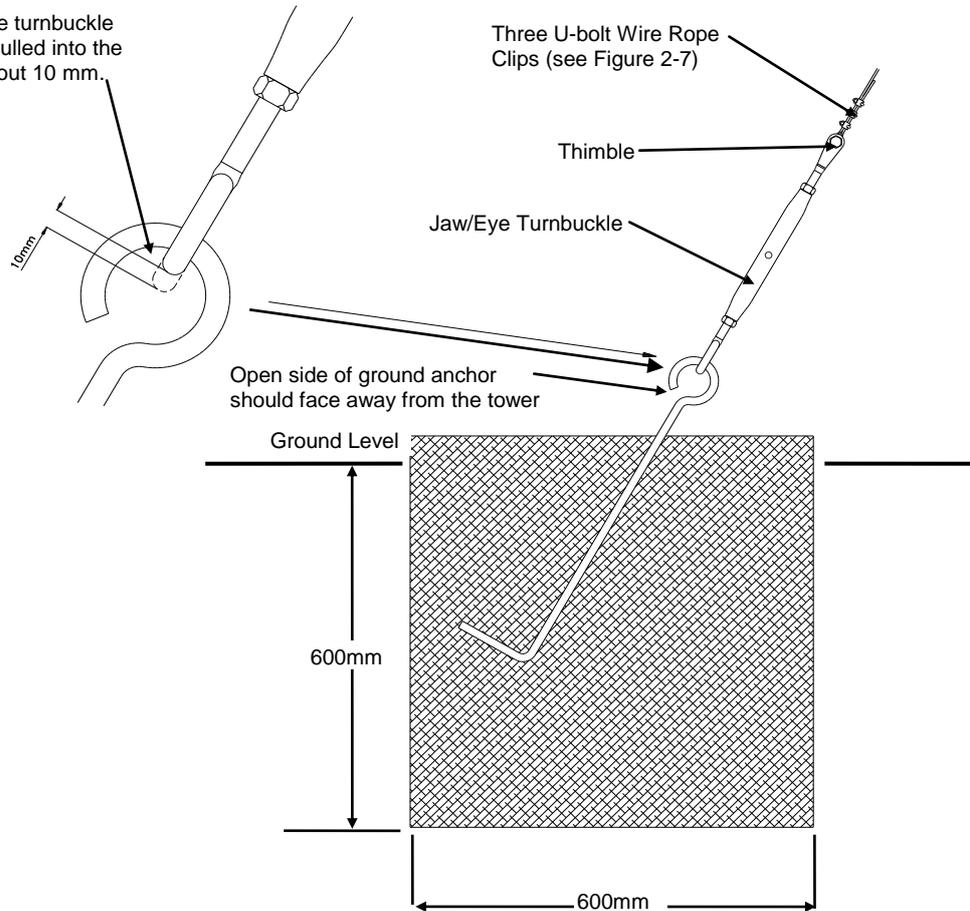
Installation of the Guy Wires to the Ground Anchors
